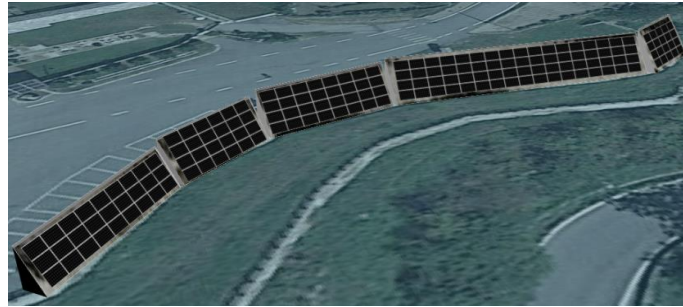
Rendering of the wall's plant, tilt = 60° [19]
